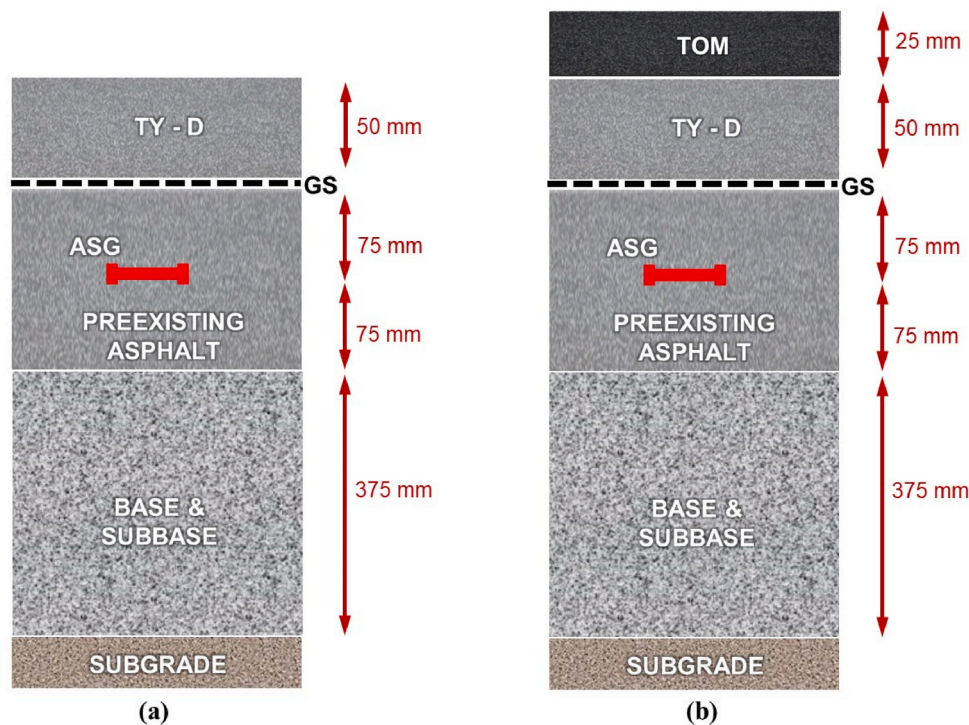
Road profile showing location of ASG sensors in the test sections: (a) Pavement Configuration A; and (b) Pavement Configuration B.
